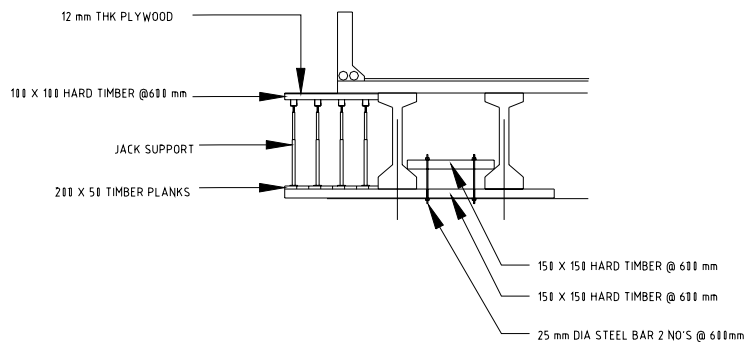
Jack Support Type for Cantilever Slab
